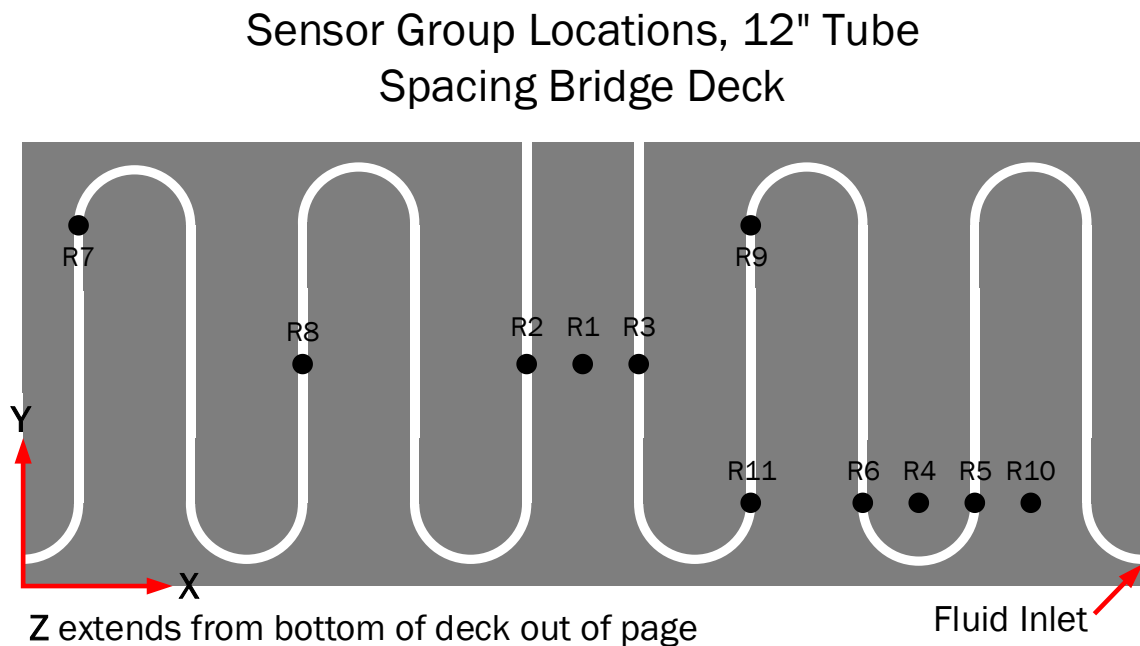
Plan view of the sensor locations in the 30 cm side.
